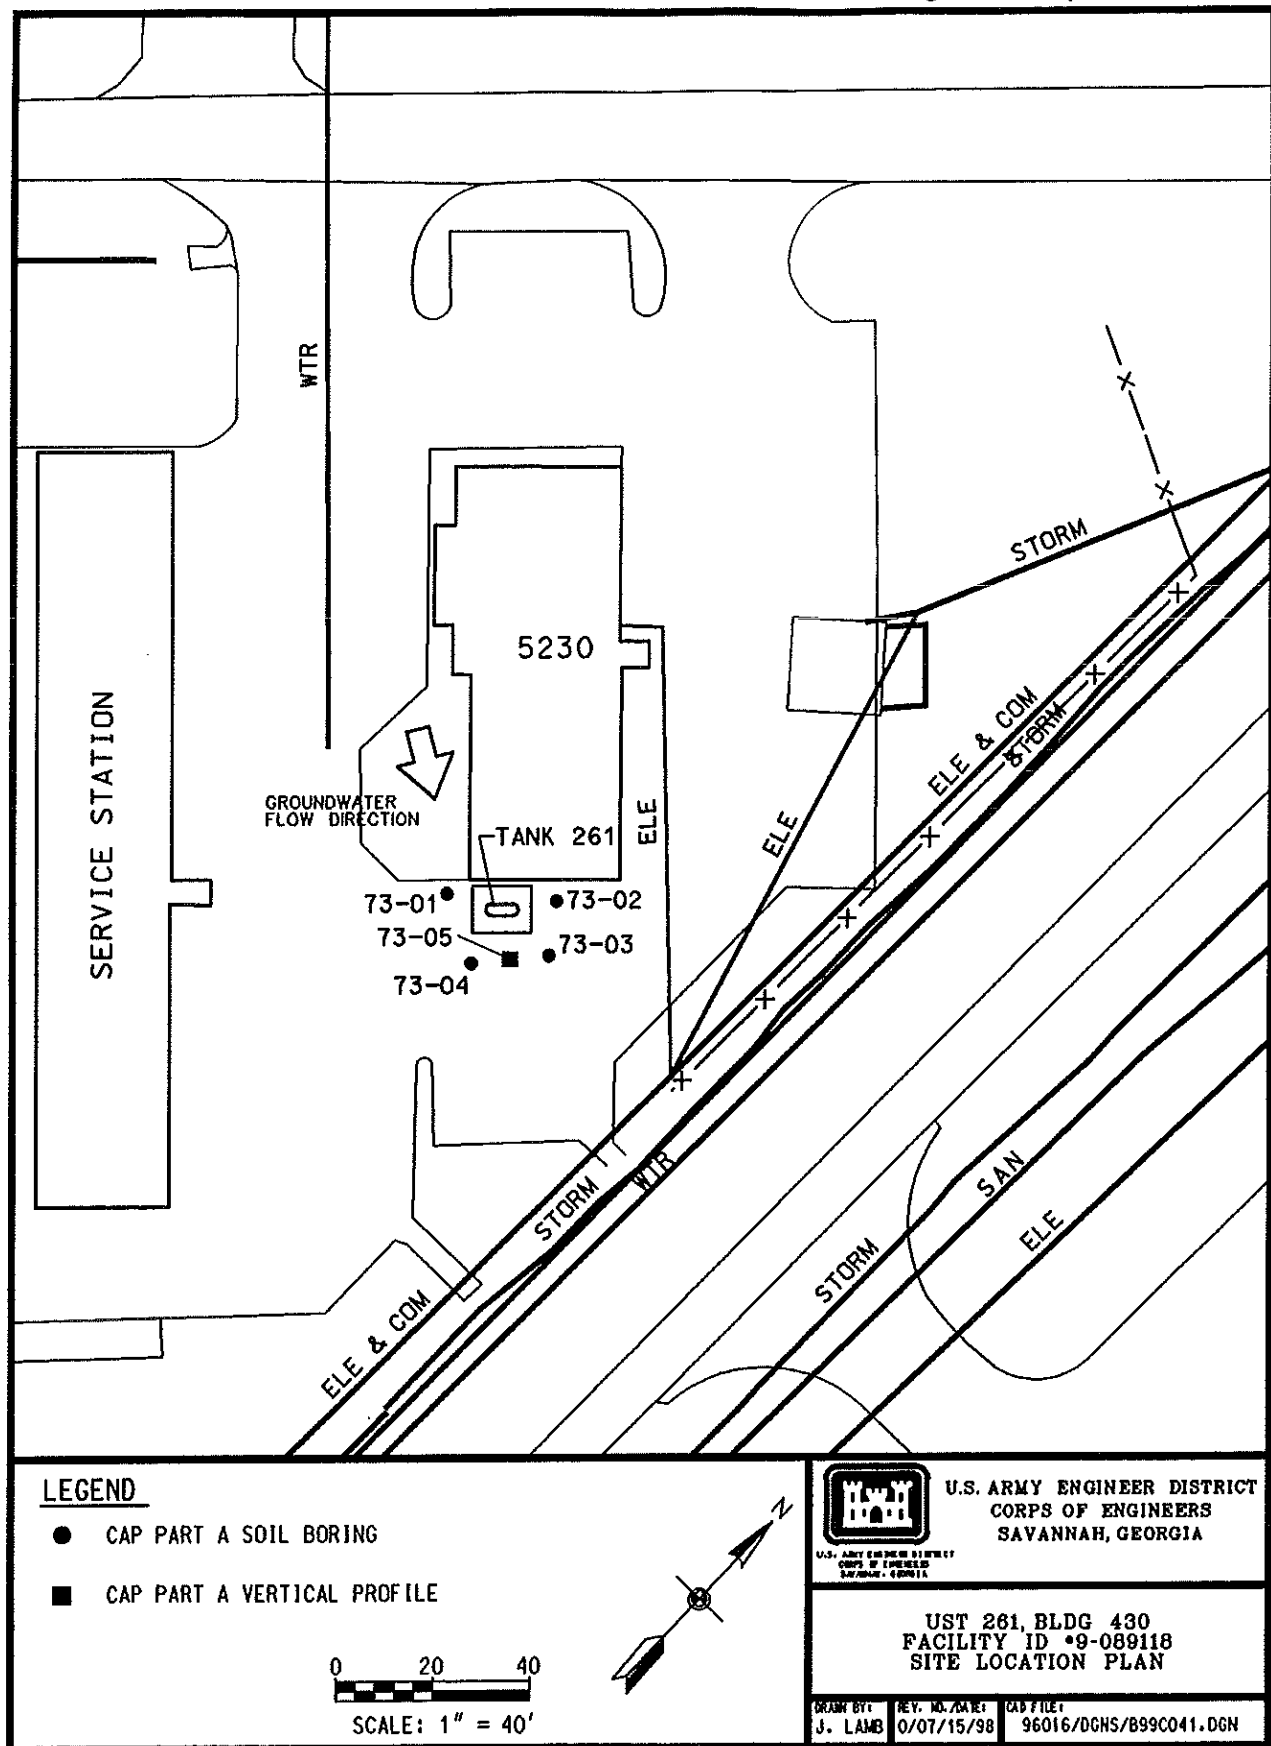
Site Plan for the UST 261, Building 430 Site Investigation
